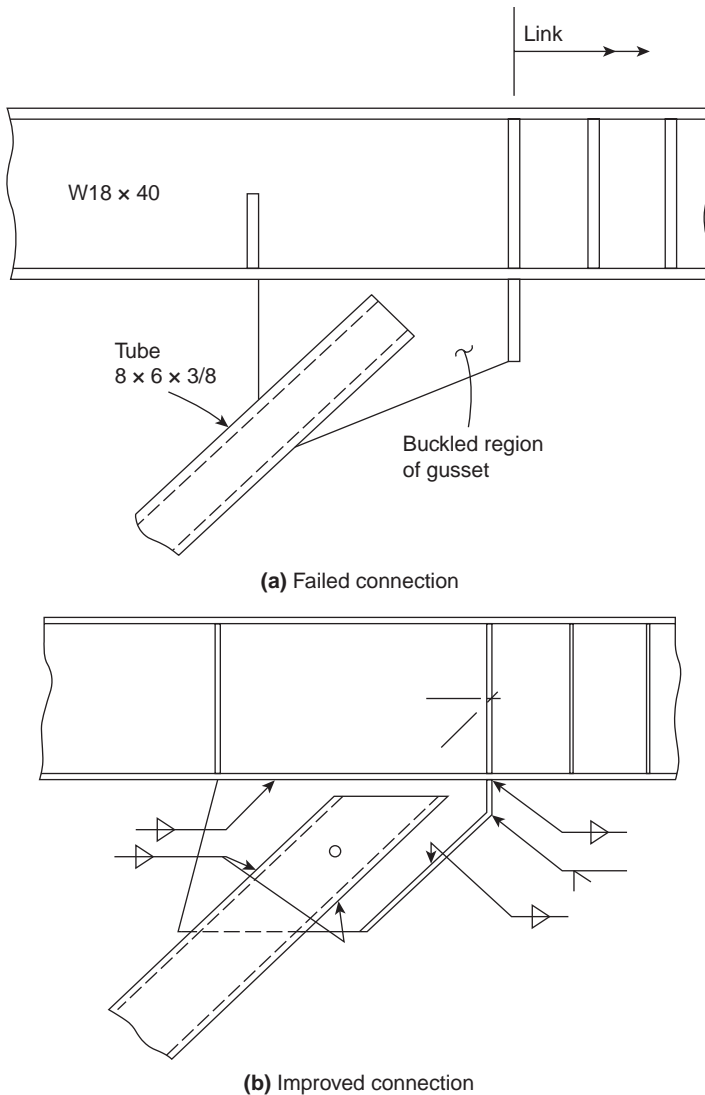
Brace-to-beam gusset connection. (Courtesy of M.D. Engelhardt, Dept. of Civil Engineering, University of Texas, Austin.)
